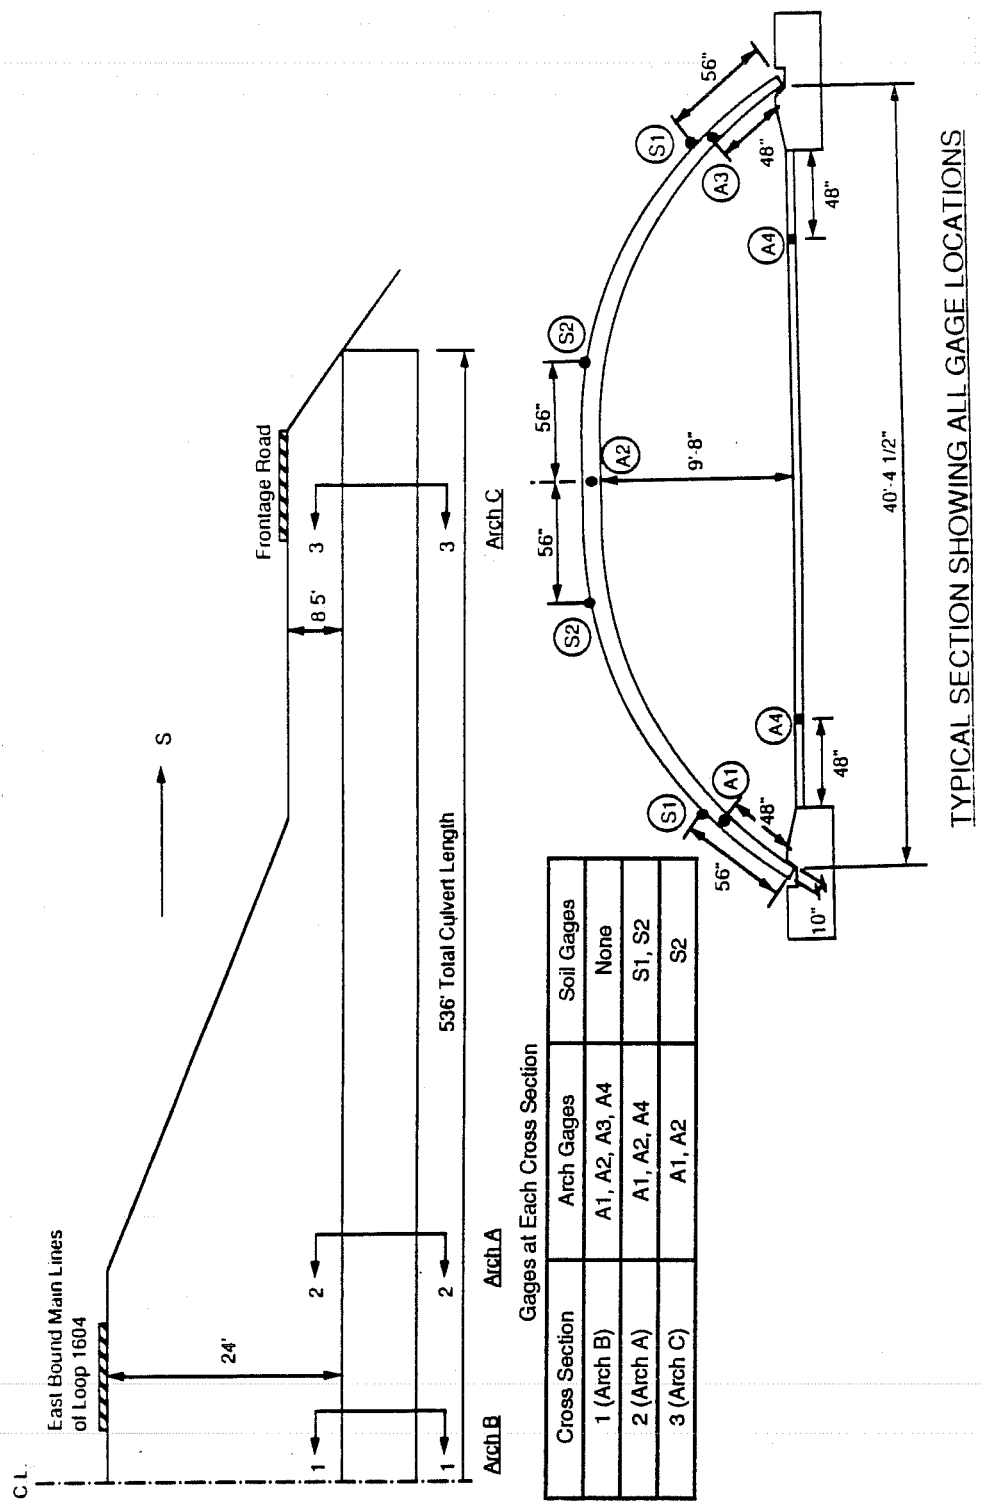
Elevation and section of BEBO arch culvert showing locations of soil pressure and strain gages.
